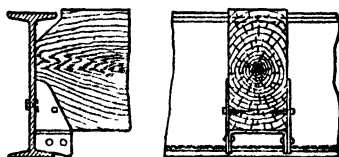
Wooden Beam Framed to I Beam with Duplex Shelf-hanger
